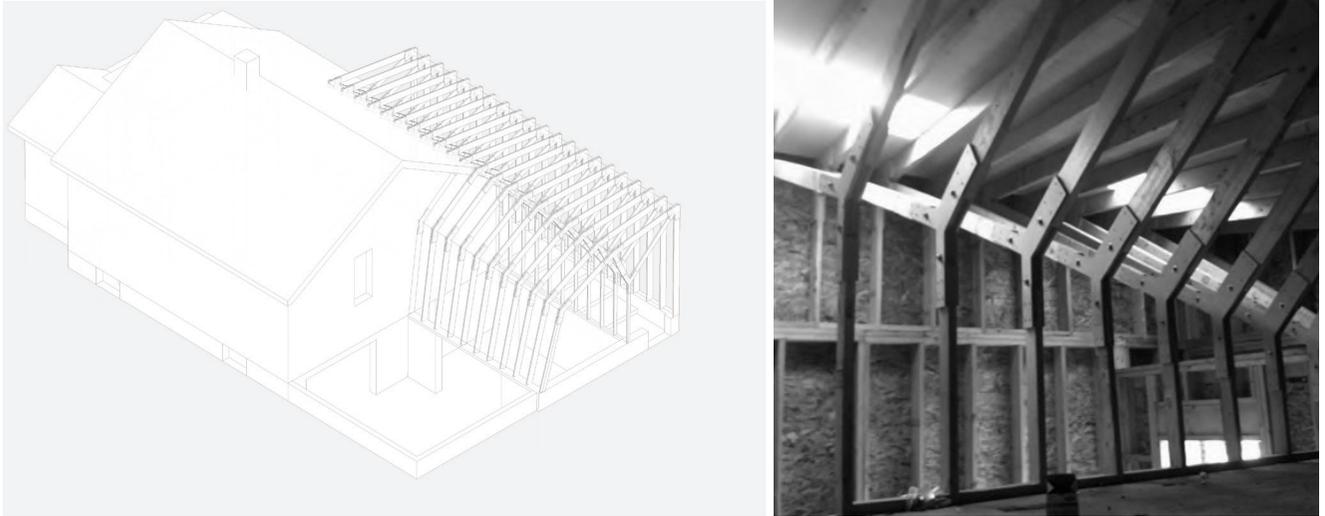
& 23: Left; an axonometric drawing showing the variable truss shapes. Above; an interior view under construction.
